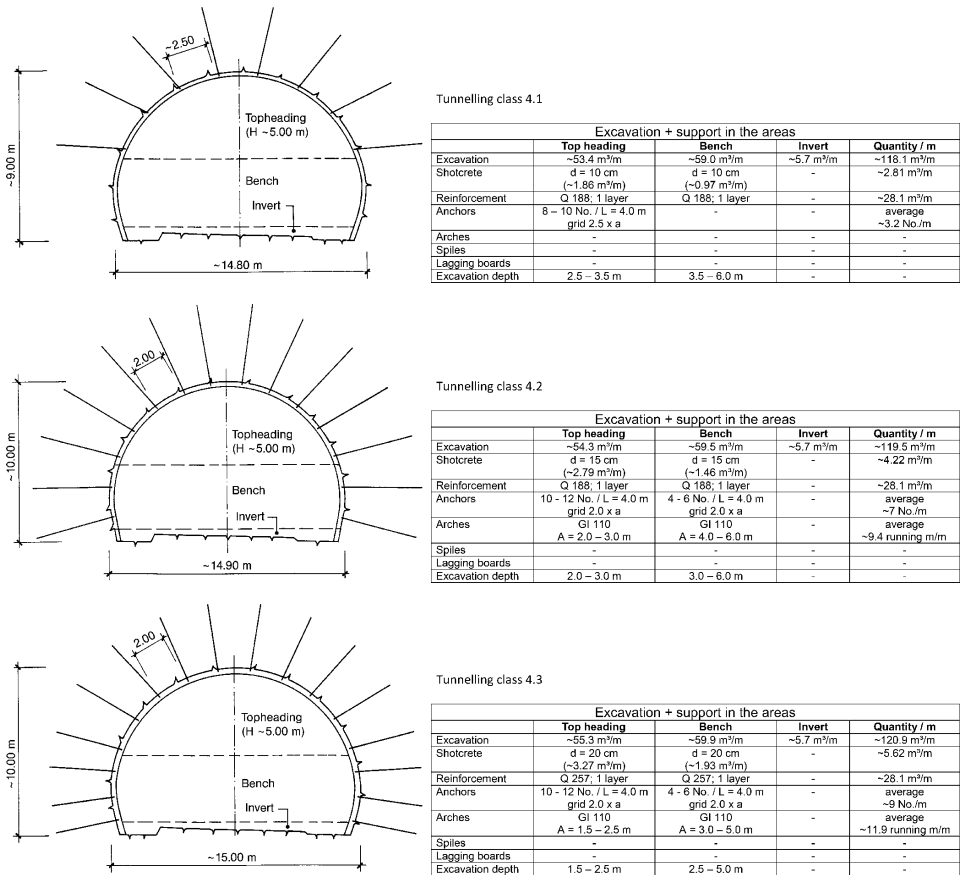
Summary of the tunnelling classes for the Oerlinghausen Tunnel (VK 4.1/4.2/4.3).
